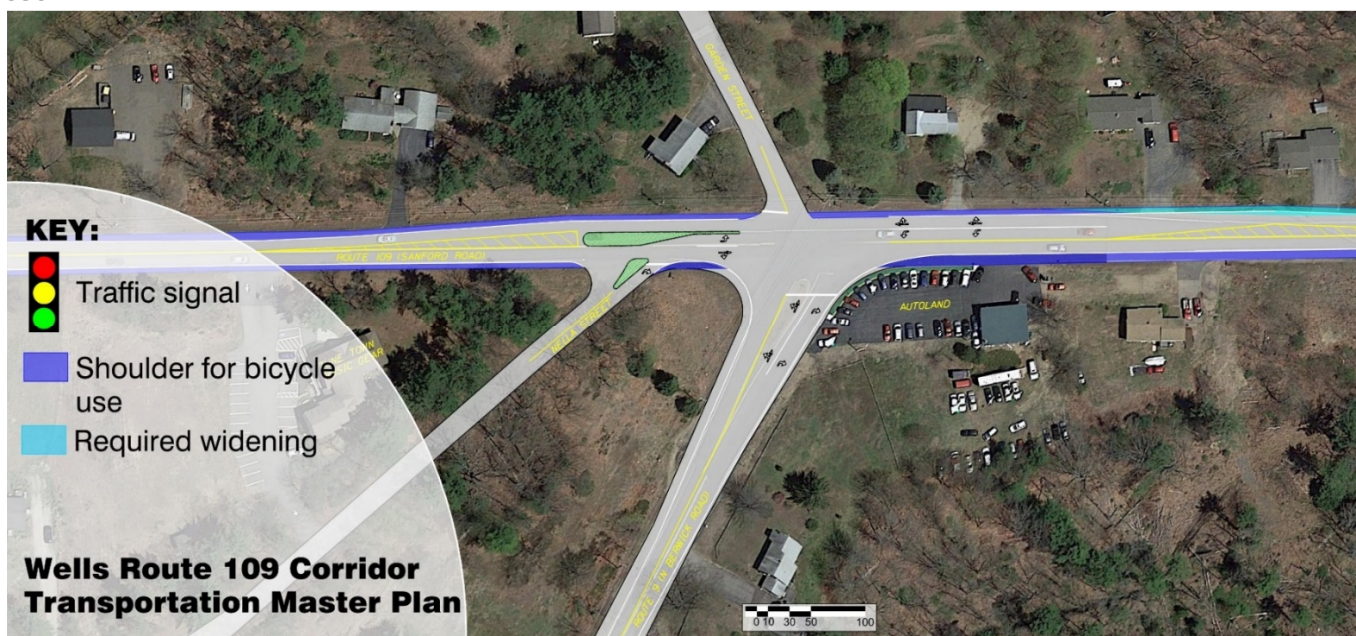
RECOMMENDED IMPROVEMENTS FOR THE INTERSECTION OF ROUTE 109 (SANFORD ROAD) AND ROUTE 9 (NORTH BERWICK ROAD)/GARDEN STREET
